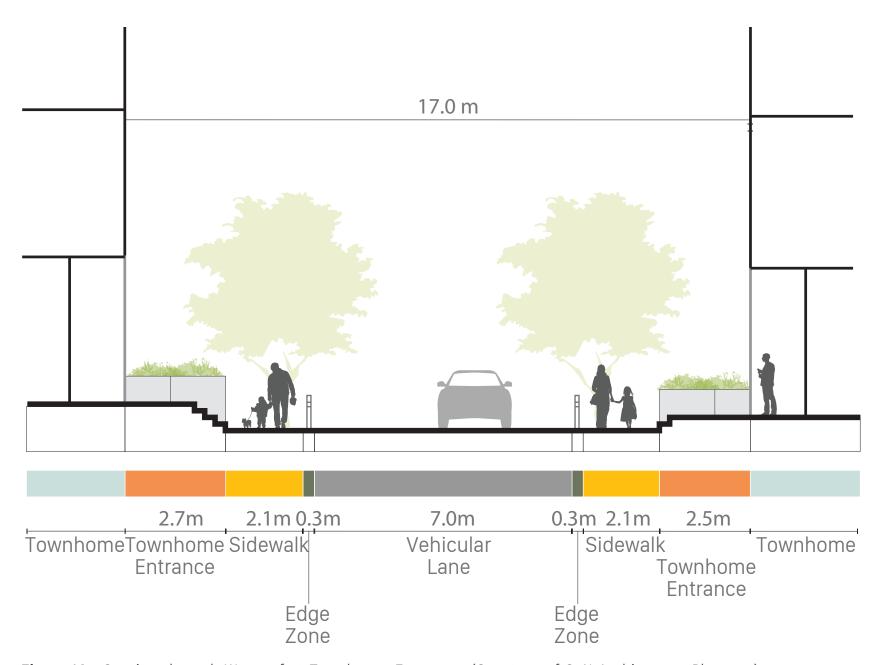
Section through Woonerf at Townhouse Frontages (Courtesy of SvN Architects + Planners)
